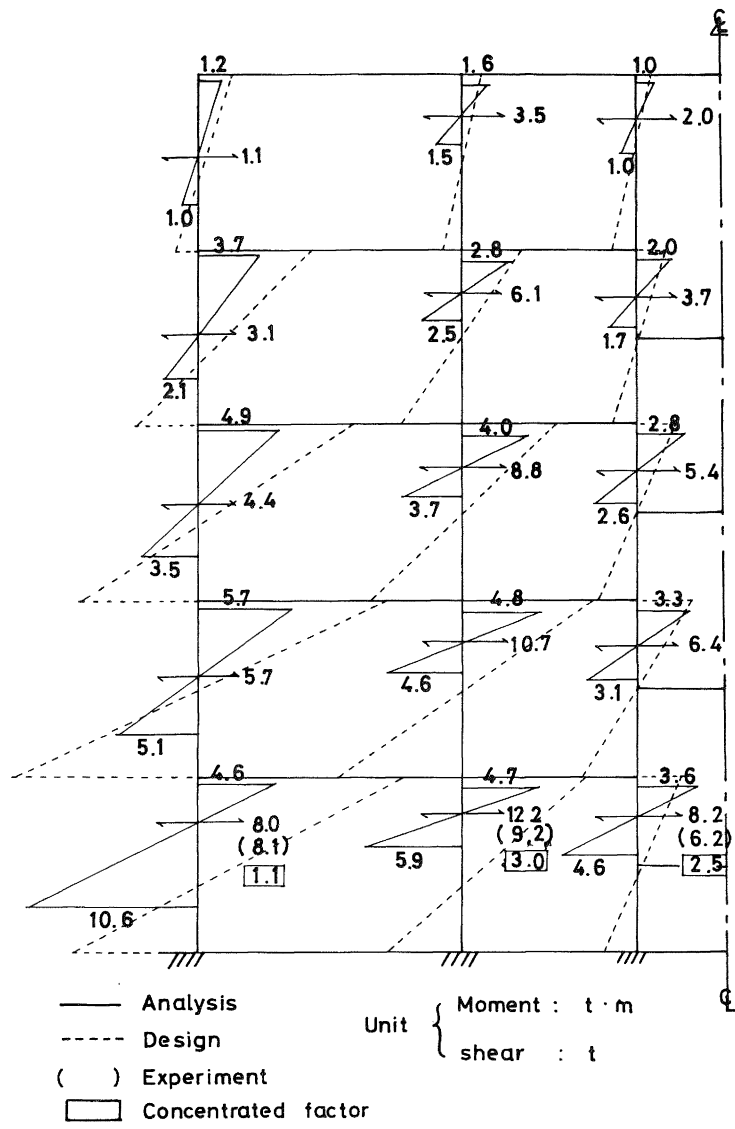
Stress distribution in walled columns of C frame (At load scale 1)
